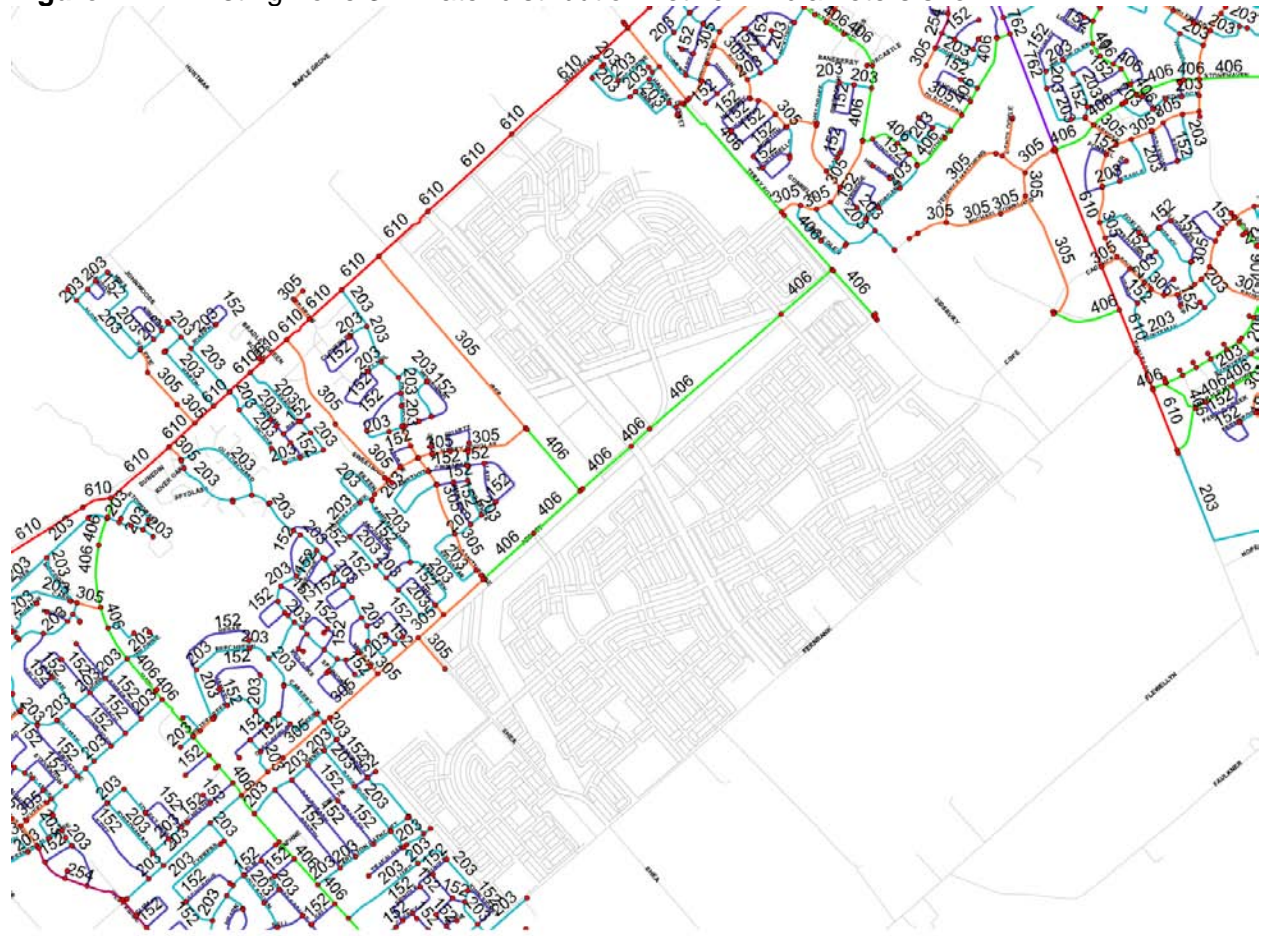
Build-out watermain alignment and sizing (pipe diameters shown in mm)
